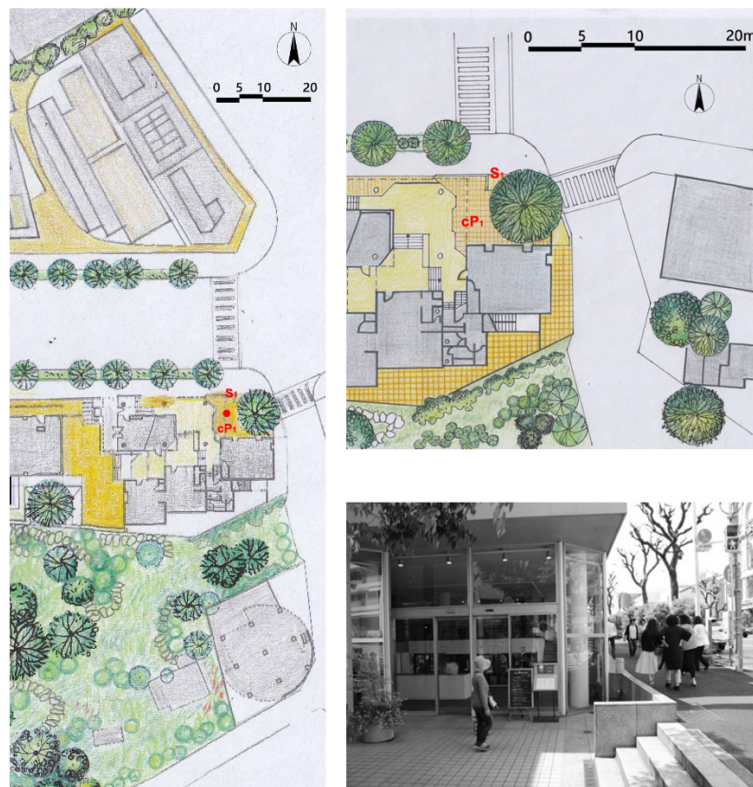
The corner plaza (cP) and staircase (S) in Building A. (Source from: drawing and photo from the author)
